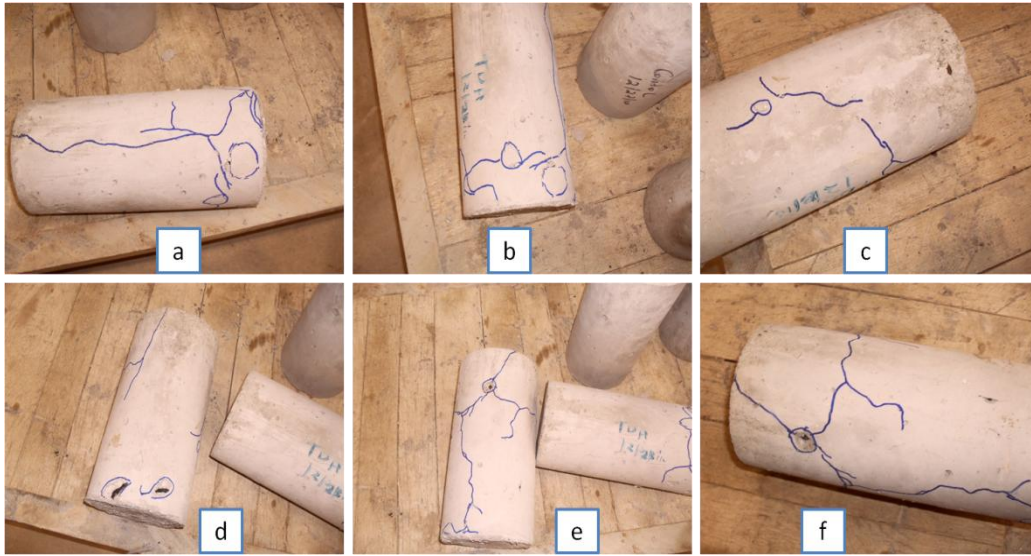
Cracks and spalling on TDA Concrete after exposure to 200°C for 3 hrs in the oven.
